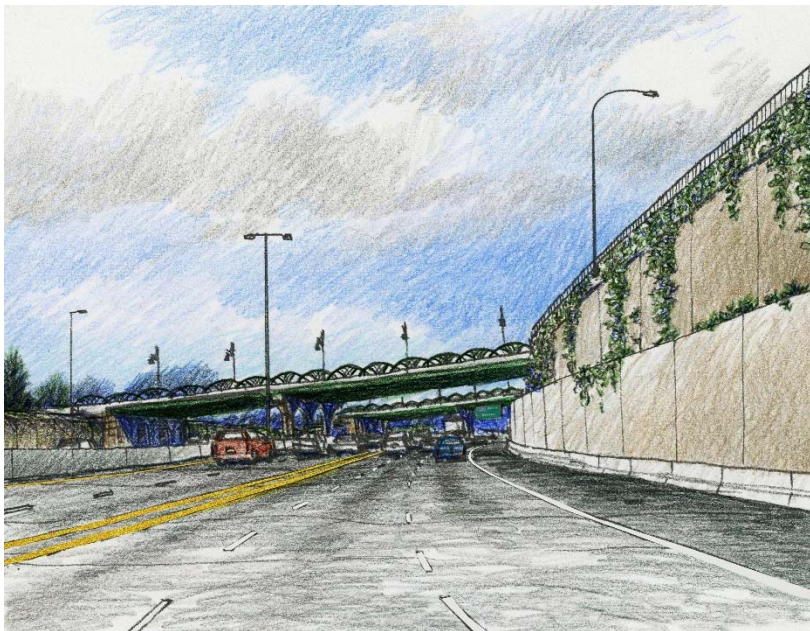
View A, South of Cedar and Renton Avenue Bridges over I-405, Existing Conditions
